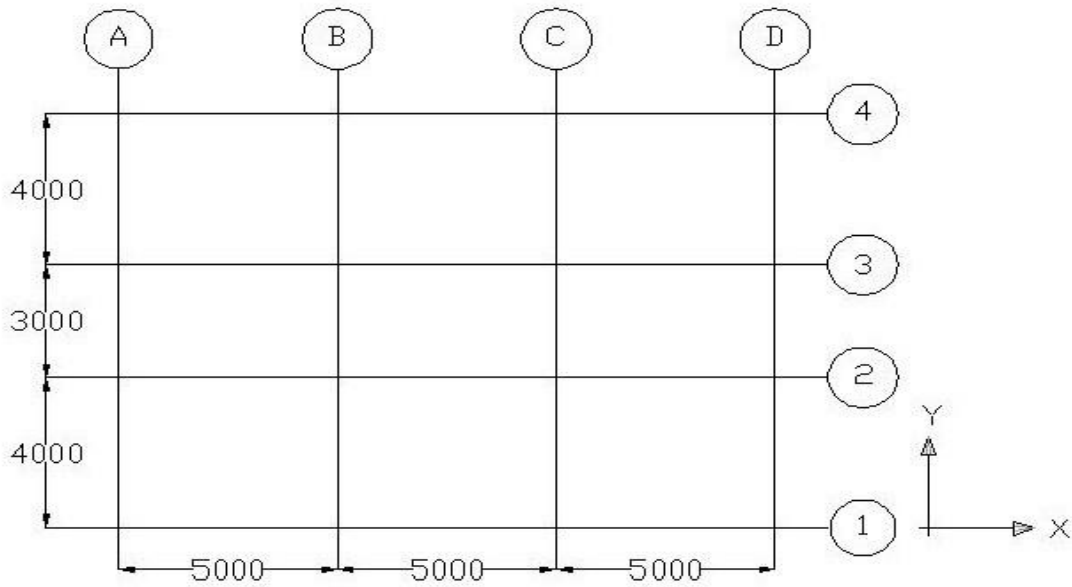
TYPICAL GRIDLINE PLAN OF MODELS
